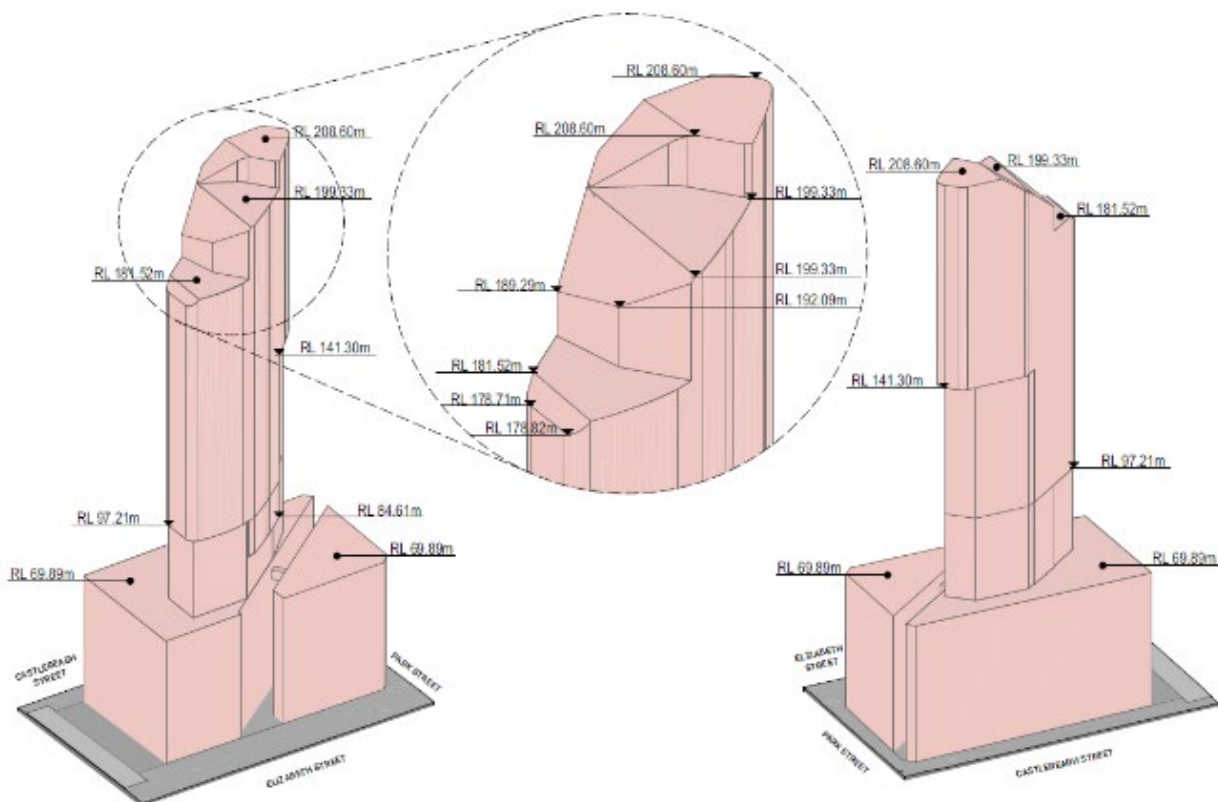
| Proposed axonometric diagrams: Elizabeth Street elevation (left) and Castlereagh Street elevation (right) (Source: Ethos Urban building envelope drawings)
